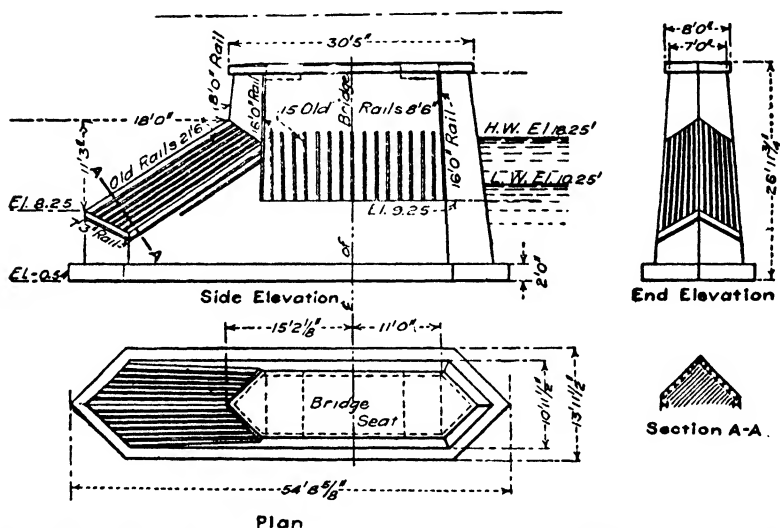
Pier with Ice-breaking Cutwater. Flag Point Bridge of Copper River and Northwestern Railway, Alaska.
